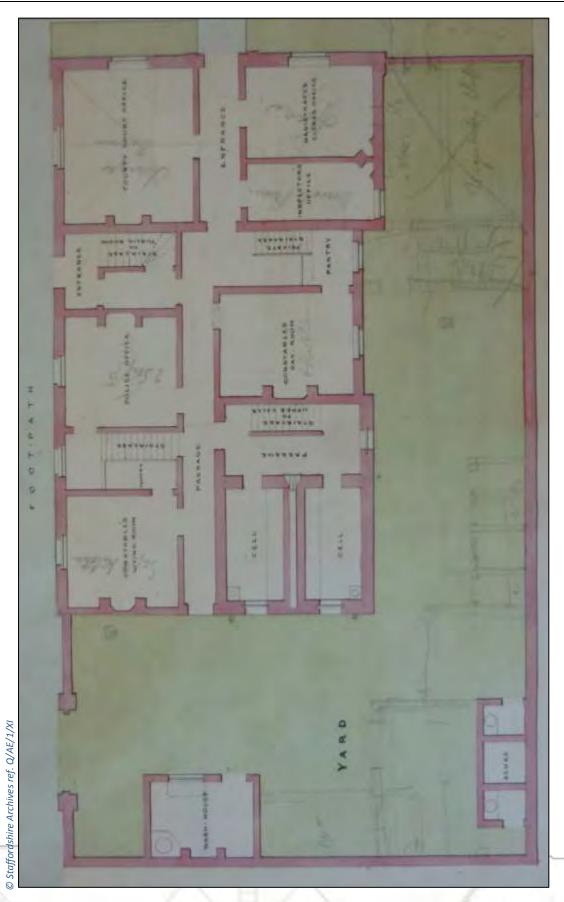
Ground floor plan of Burton-upon-Trent Police Station, 1856.
